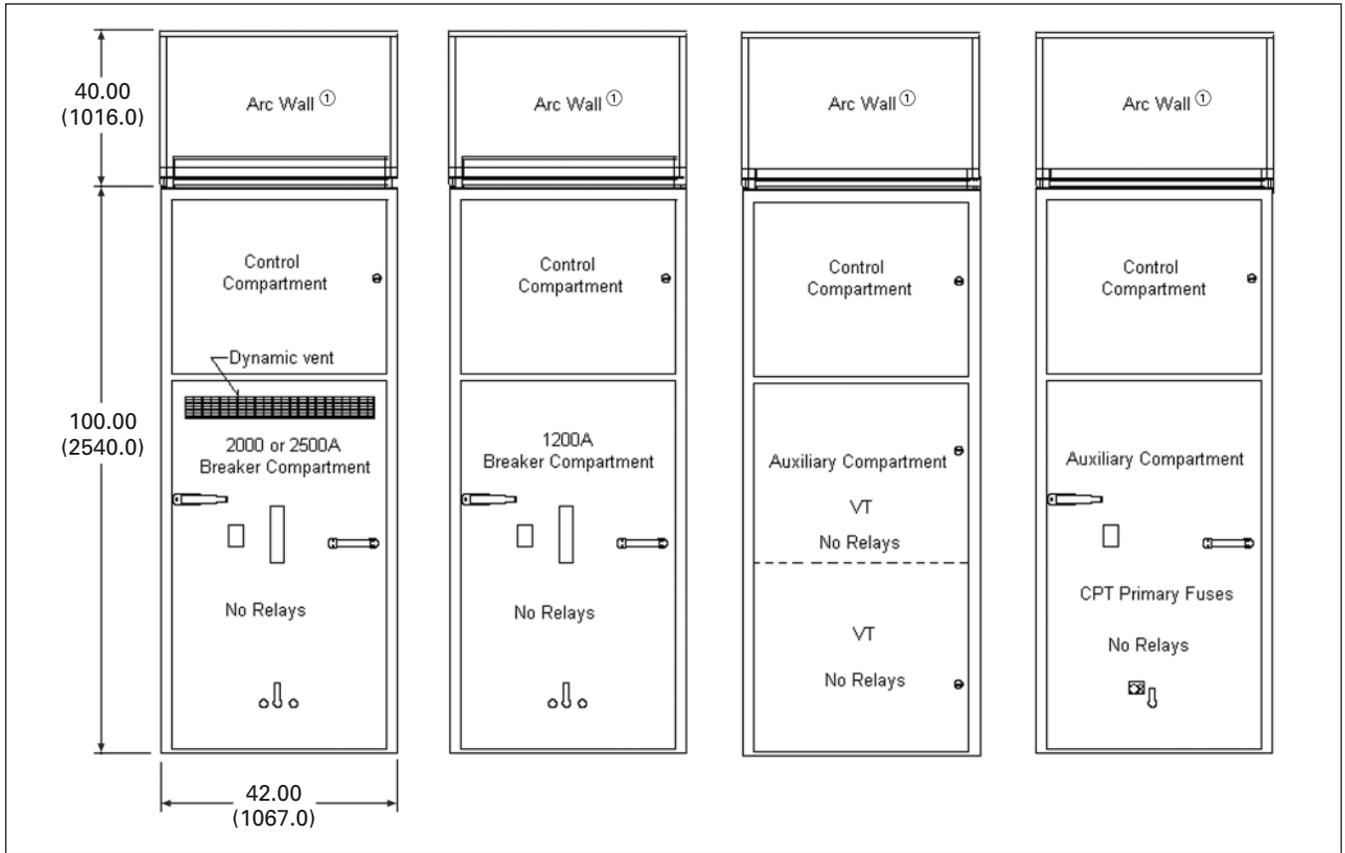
Typical Arc-Resistant Switchgear Application Layouts—38 kV
